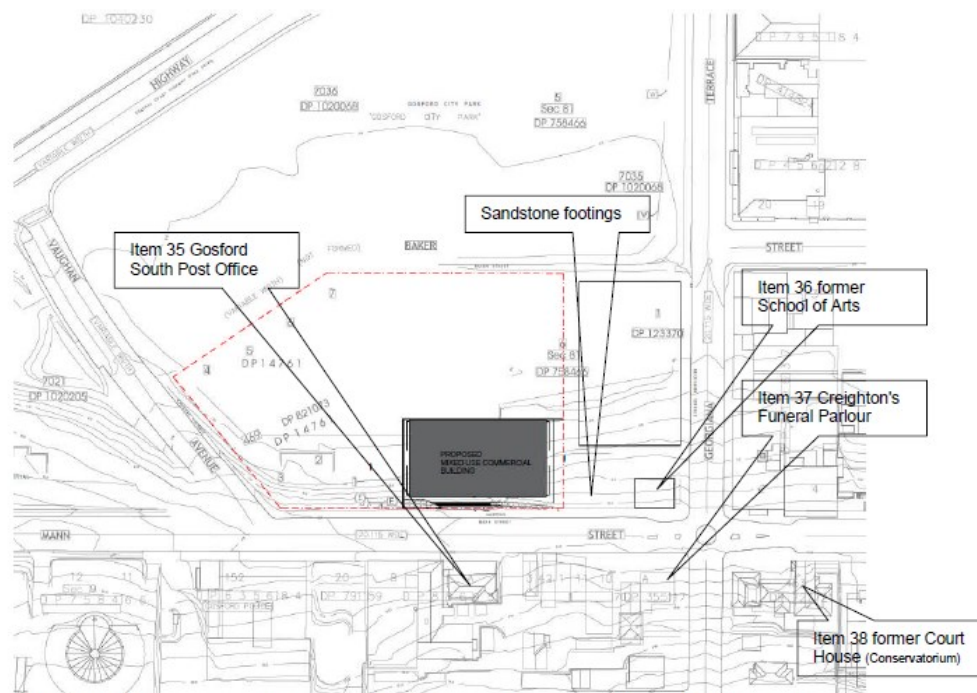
A site plan showing the proposed new commercial development in relation to the Post Office, the School of Arts building, footings and other nearby heritage items. (Source - Group GSA Pty Ltd)
